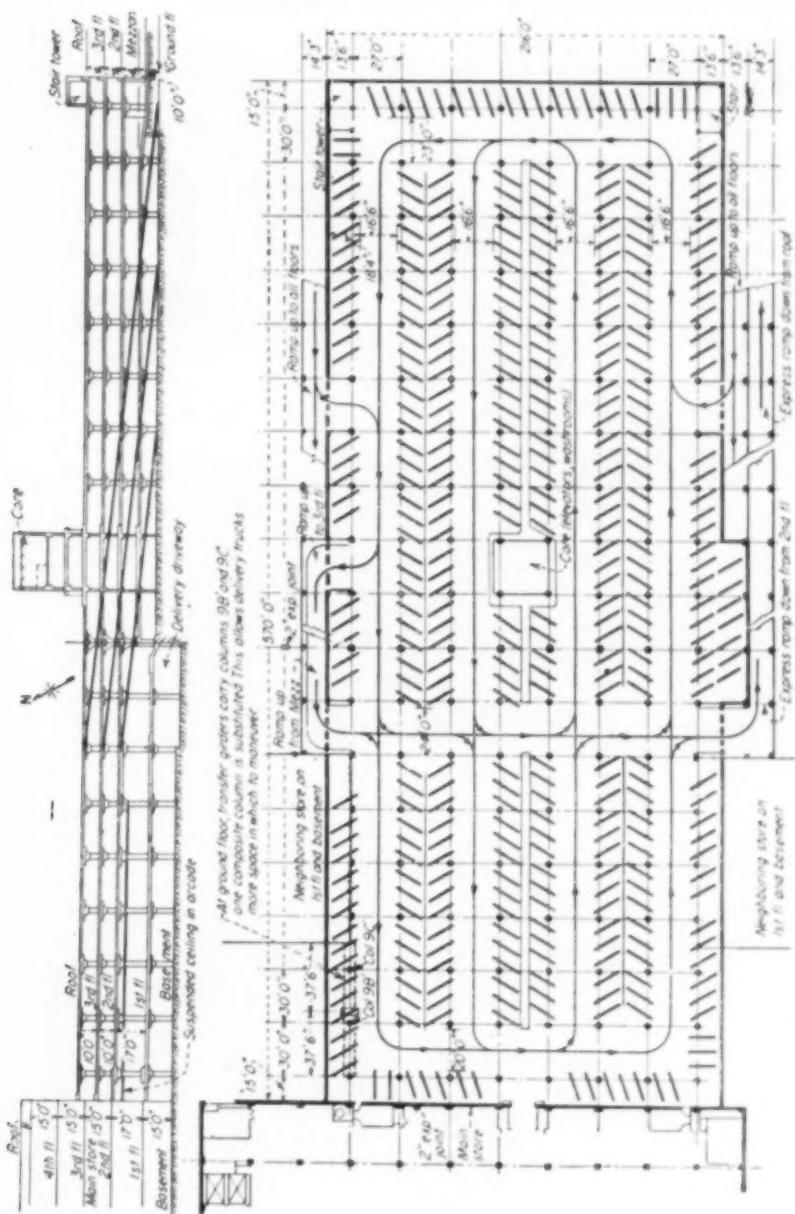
Garage in the U.S.A.: Second-floor Plan and Longitudinal Section
